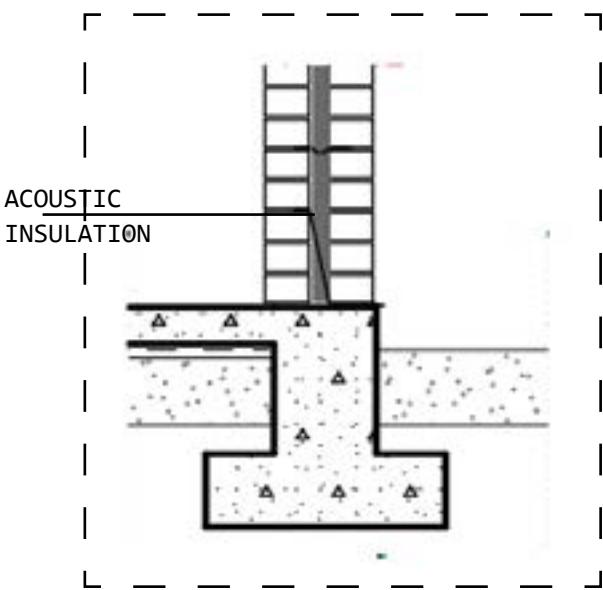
D: Cavity wall with acoustic insulation (Author, 2021)
